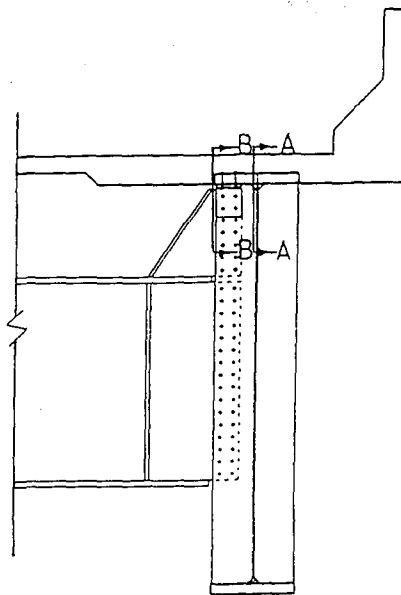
Typical Crack Found at Floorbeam Connection Plate Details
